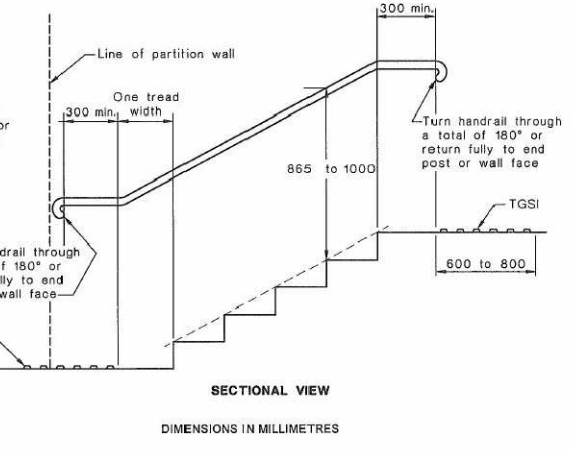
(B) STAIRWAY LOCATION AND HANDRAIL EXTENSIONS AT END OF STAIRWAY OTHER THAN AT LINE OF BOUNDARY
